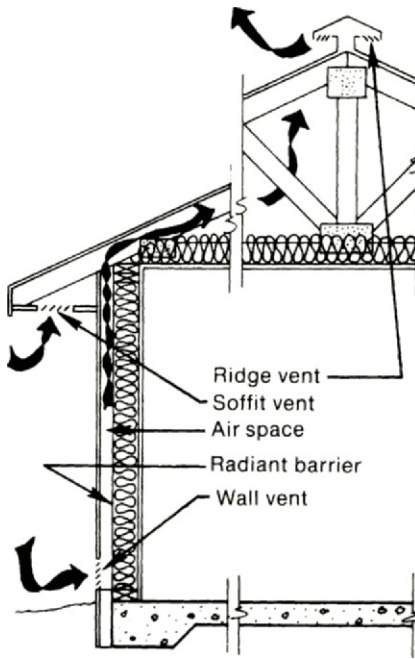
Make sure that the airflow from soffit to ridge or gable vents is not blocked by the ceiling insulation. When wall vents are used, they act as a passive cooling technique in addition to moisture control. (From *Cooling with Ventilation*. Golden, CO: Solar Energy Research Institute, 1986 (SERI/SP-273-2966; DE8601 701).)
